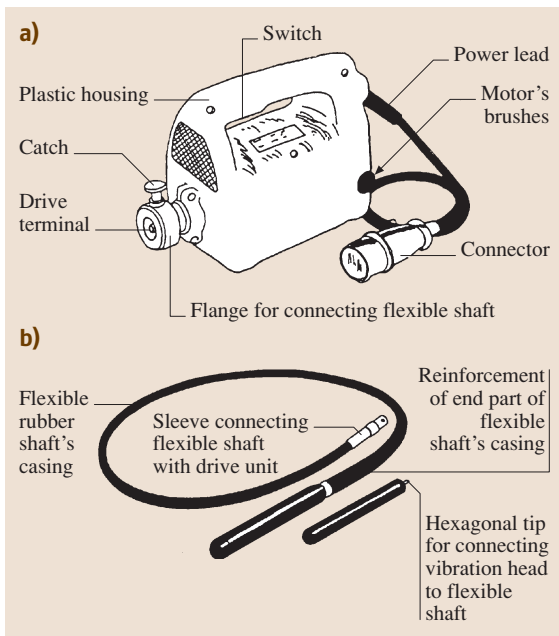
,b Eccentric-type immersion vibrator driven by single-phase commutator motor and flexible shaft: (a) drive unit; (b) flexible shaft and vibration head
